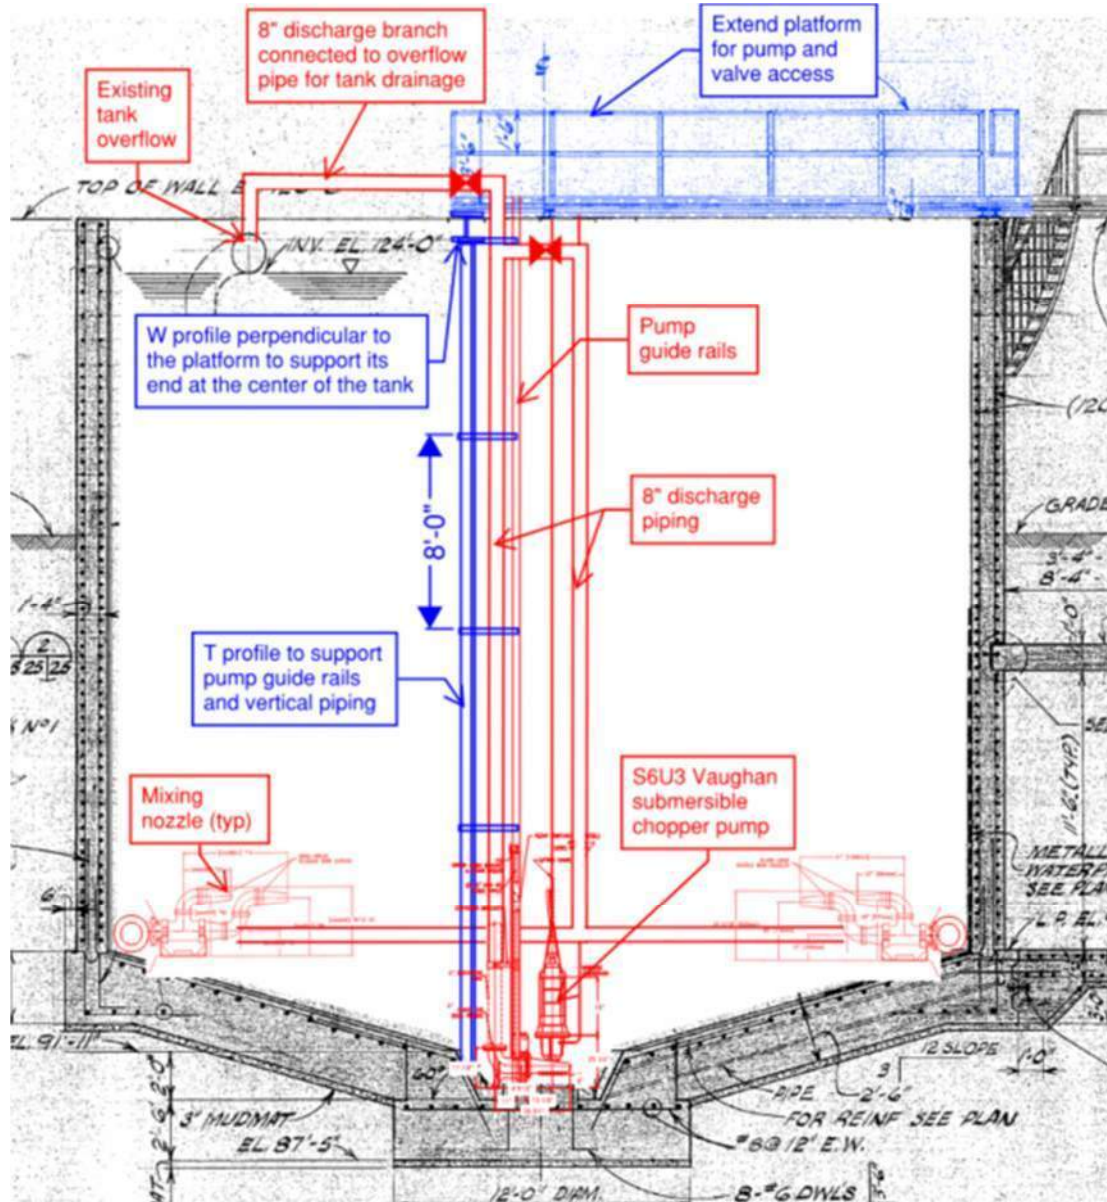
Alt-A6 Pumped Recirculation Mixing (RotaMix)
